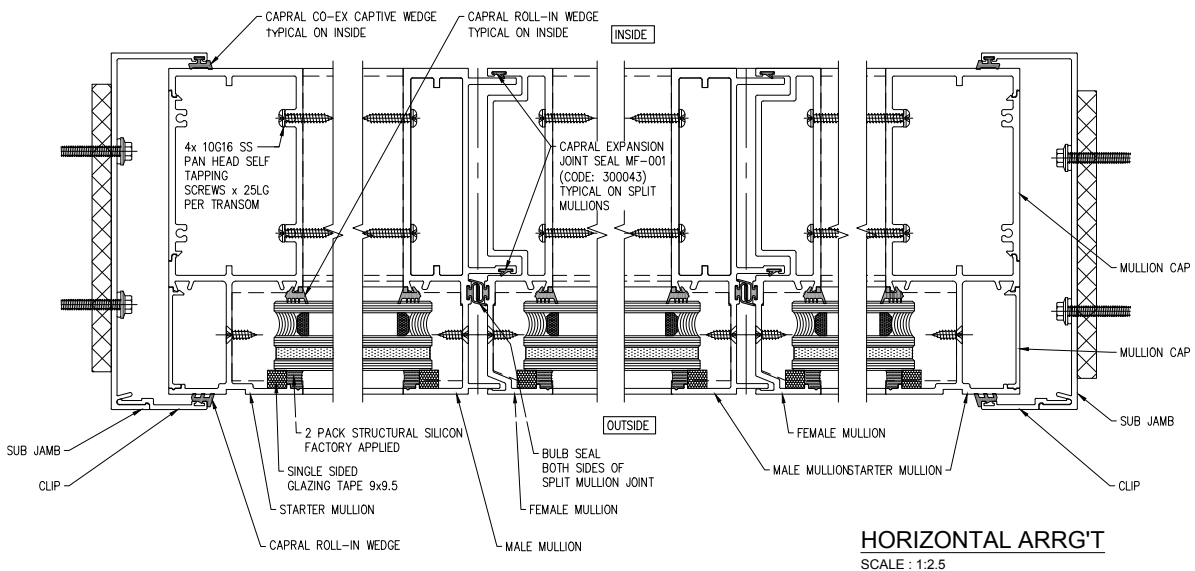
Aluminum extrusion shop front glazing suite arrangements for the podium curtain wall. © JML-Craft
